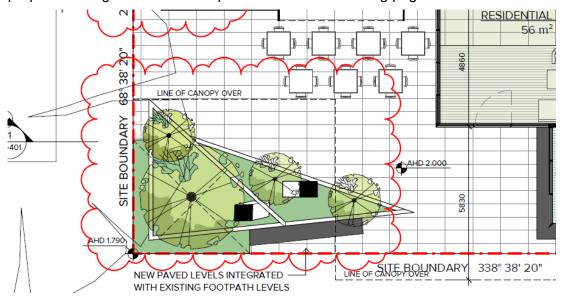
Extract of the Ground Level Plan dated 15 March 2021 showing a revised planter bed
